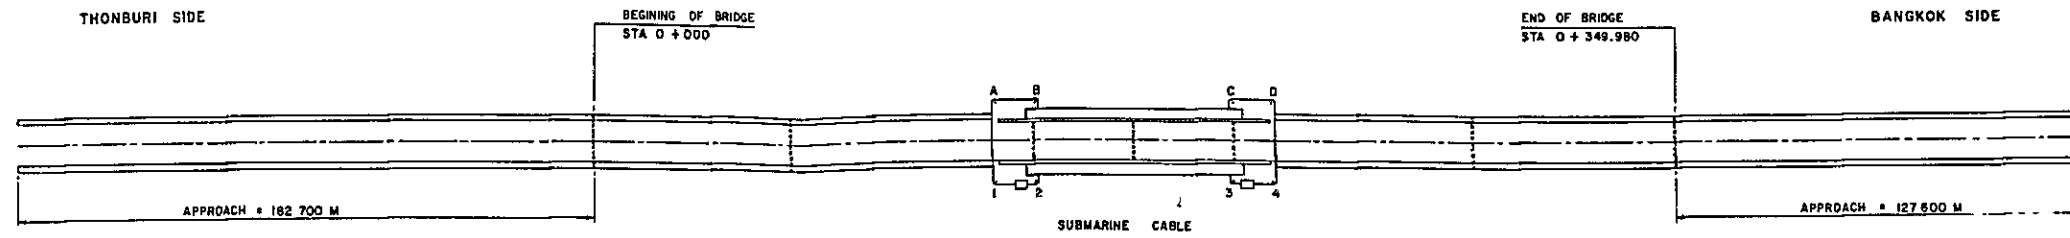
LONGITUDINAL ELEVATIONS ON THE CURBSTONE OF THE ROAD SURFACE - KRUNG THON BRIDGE
